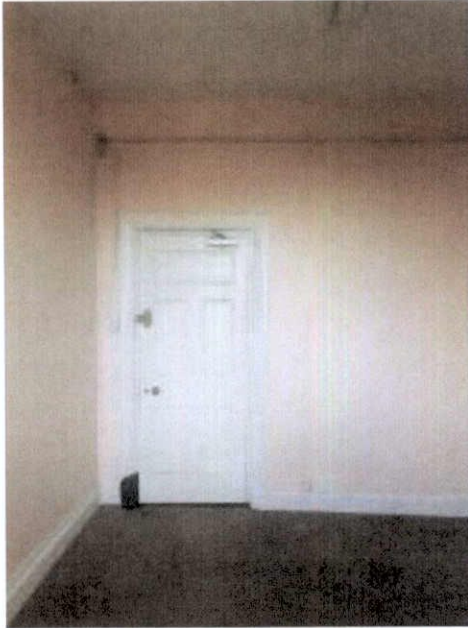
A typical dormitory in main corridor with modern door and architrave. Exposed services.
